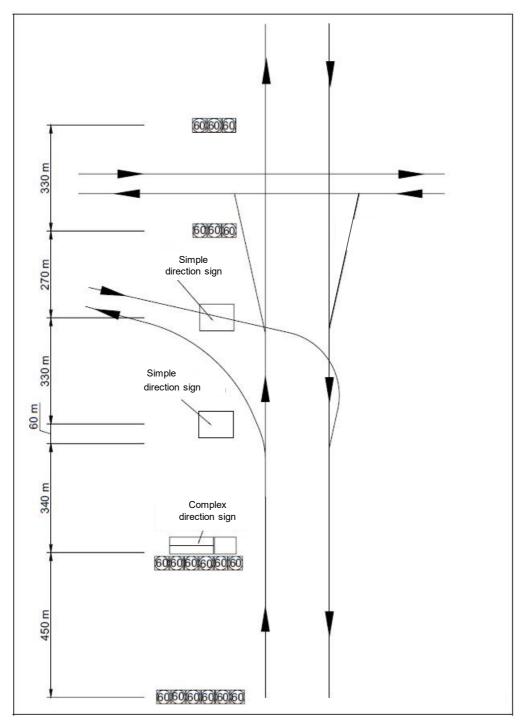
Schematic drawing of proposed LUMS and direction signs layout
